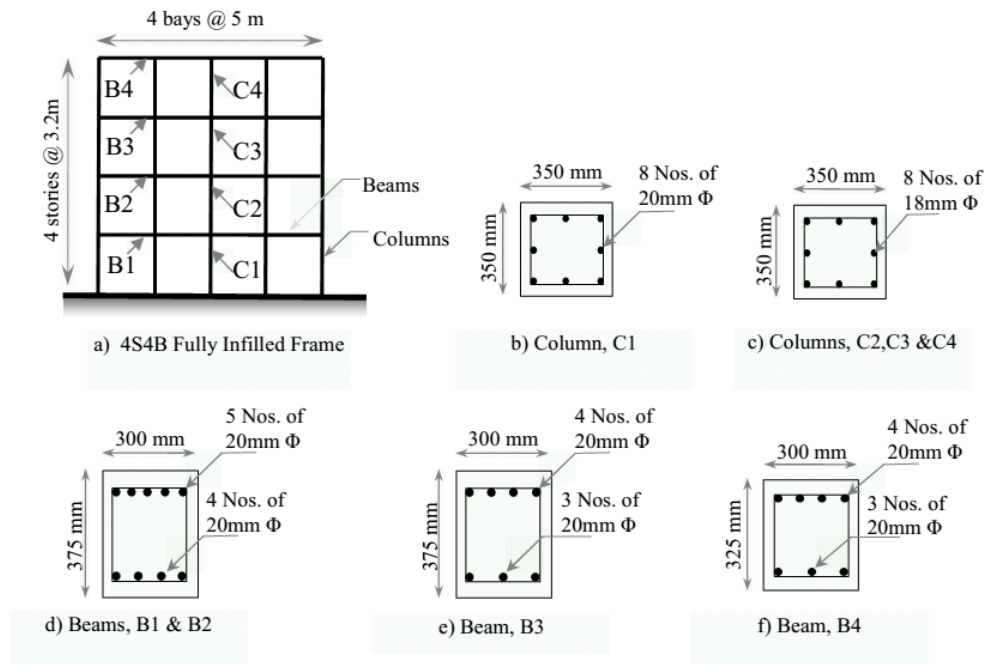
Typical 4S4B-Infilled frame and its corresponding reinforcement details
